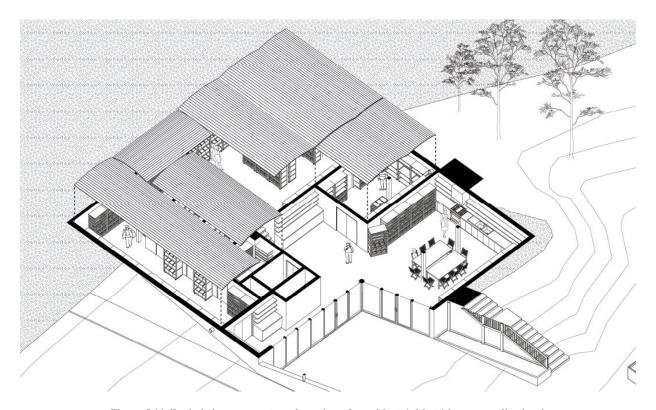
Exploded axonometric ceiling plan of new Marie's Mini Mart root cellar level.
